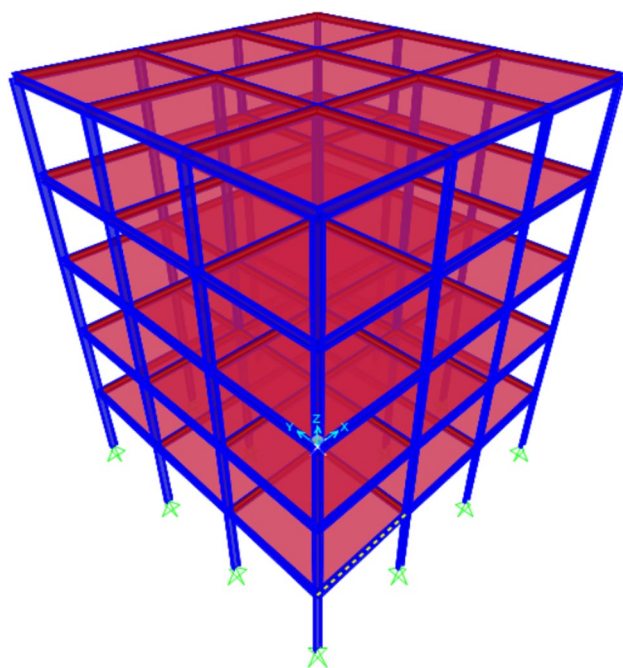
SAP2000 model of a building. The structural stability of a few models was verified using SAP (Note that infill walls are not shown in the model figure to prevent clutter)
